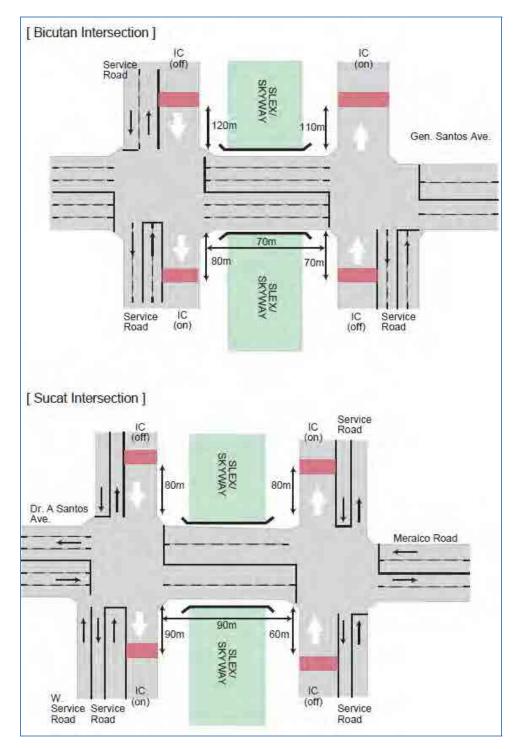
IMAGE OF BICUTAN AND SUCAT INTERSECTION LAYOUT
